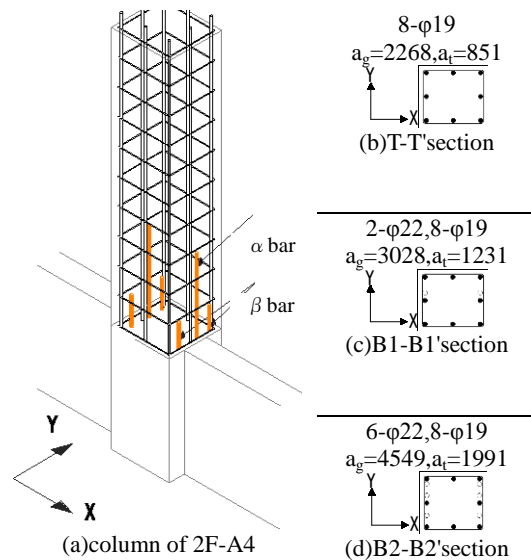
Reinforcing arrangement and the section of 2F-A4 column
